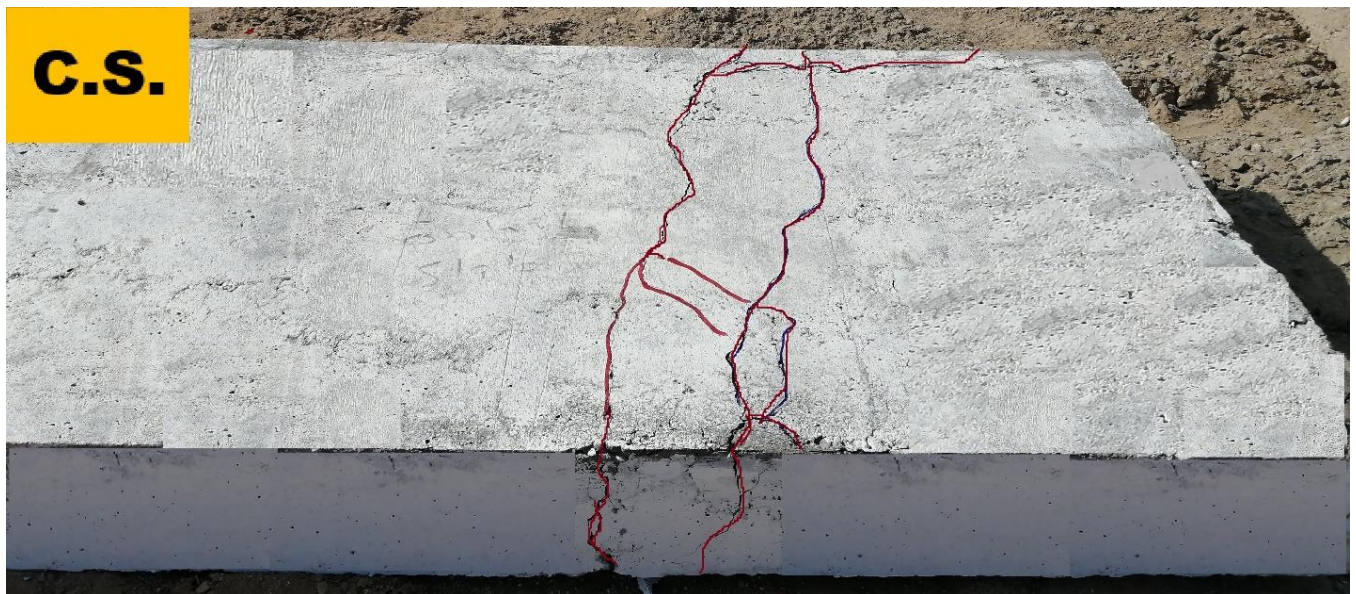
Mode of failure and crack patterns for specimen C.S.
